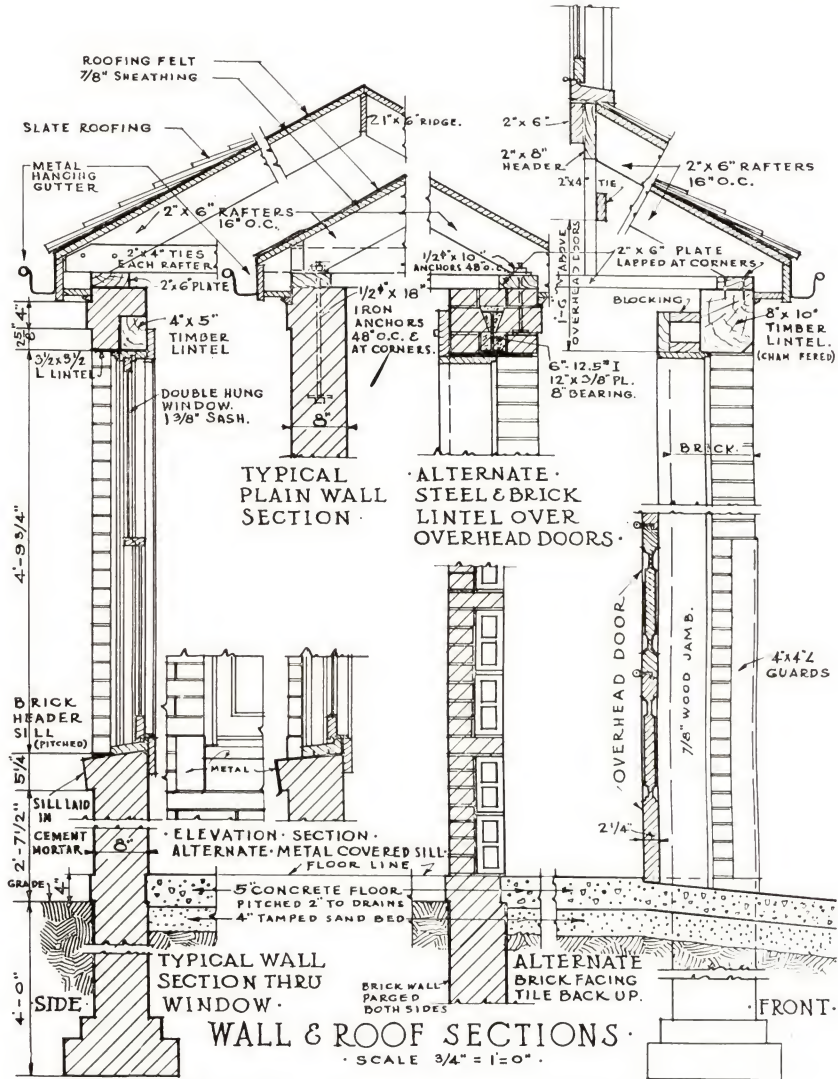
Enlarged detail sections through various parts of a brick wall.
